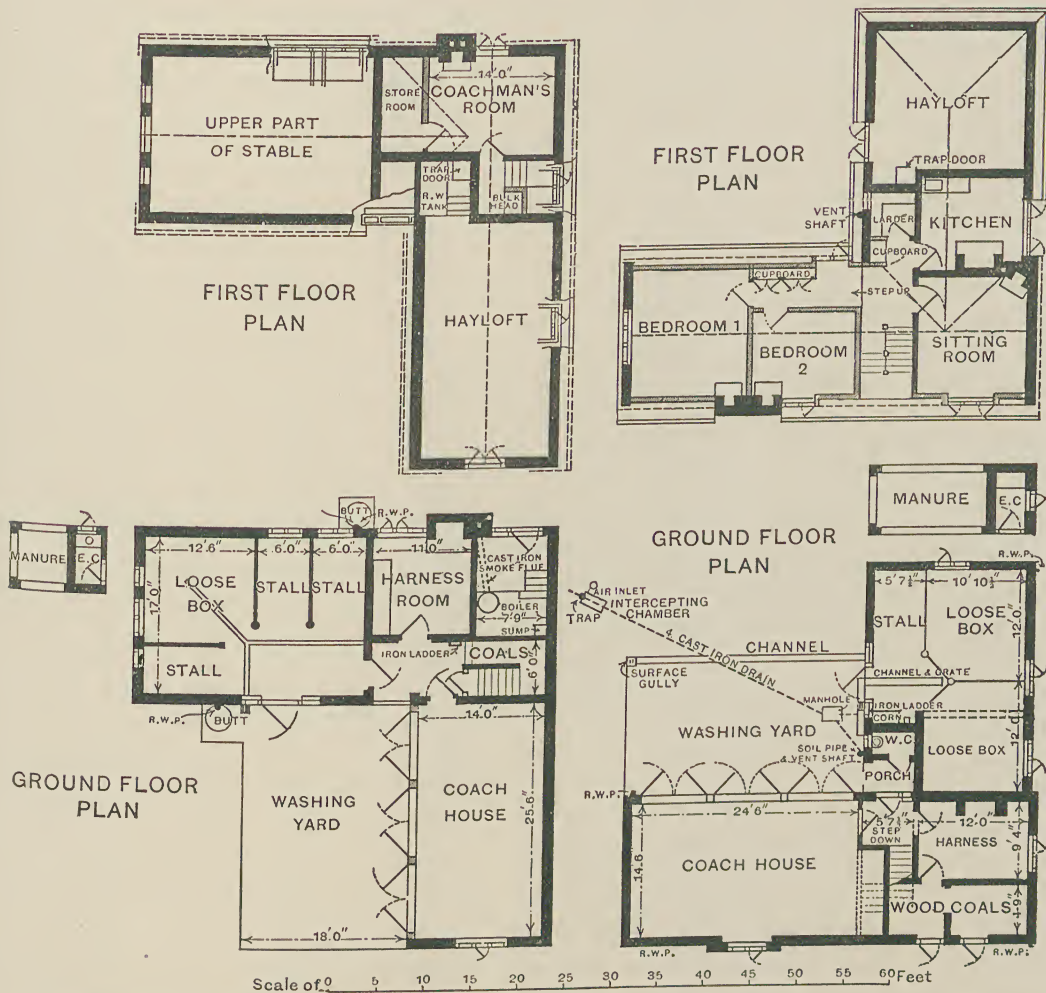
Plan of L-shaped Stables with Man's Room.
